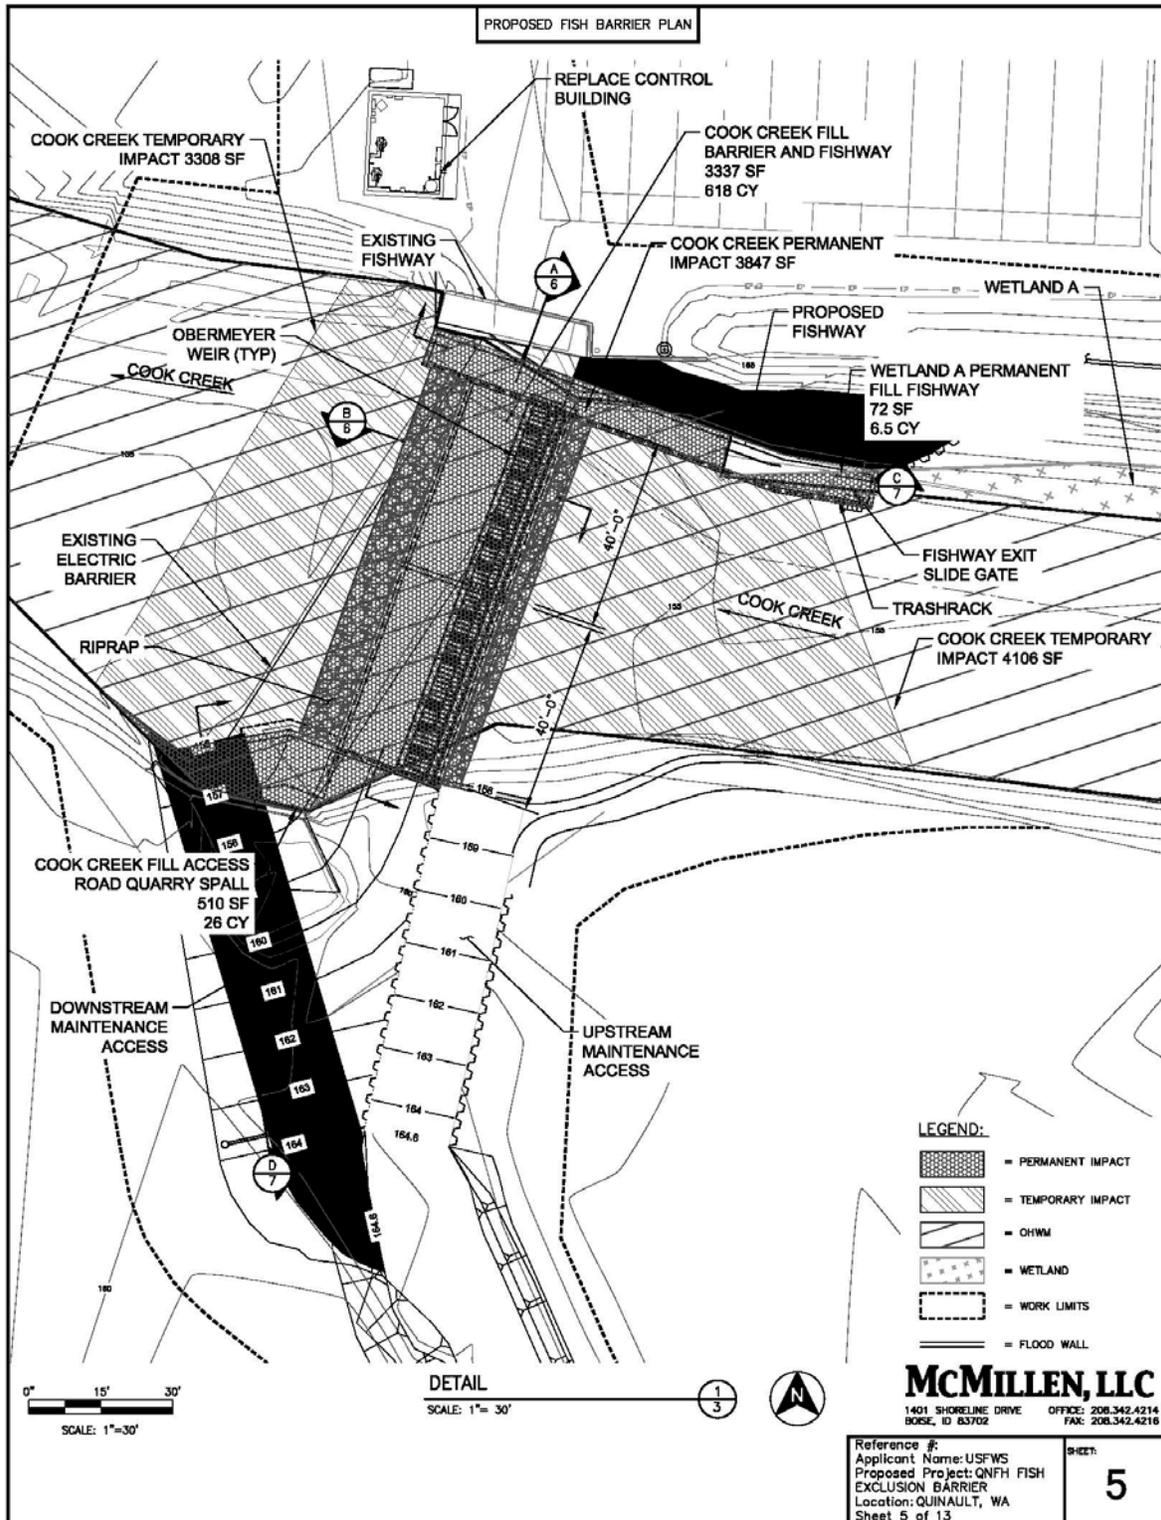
Engineering Drawing of the Fish Ladder, Weir, and Access Road
